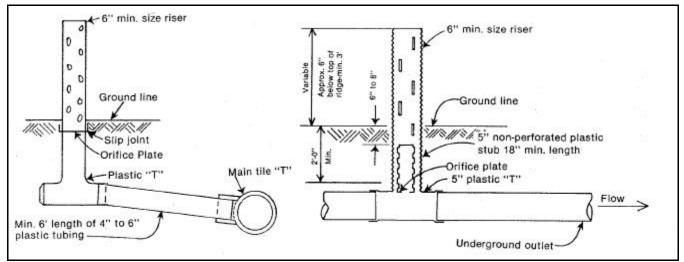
Typical Tile Drain Inlet Installation Details (Source: NRCS Files)
